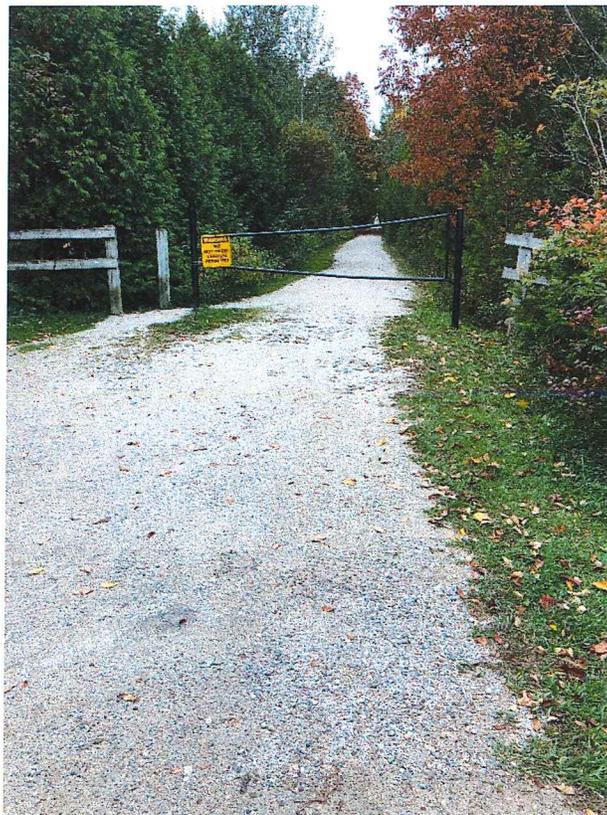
Site photo facing north near the bottom of Section A-A. Photograph taken September 29, 2020.
